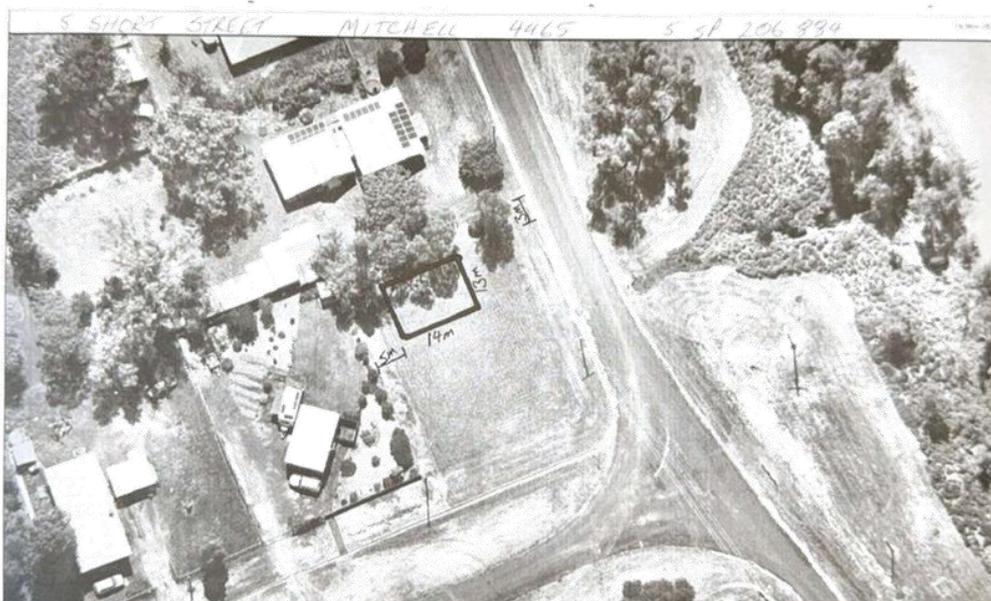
Proposed Site Plan (Source: Applicant Documents)
